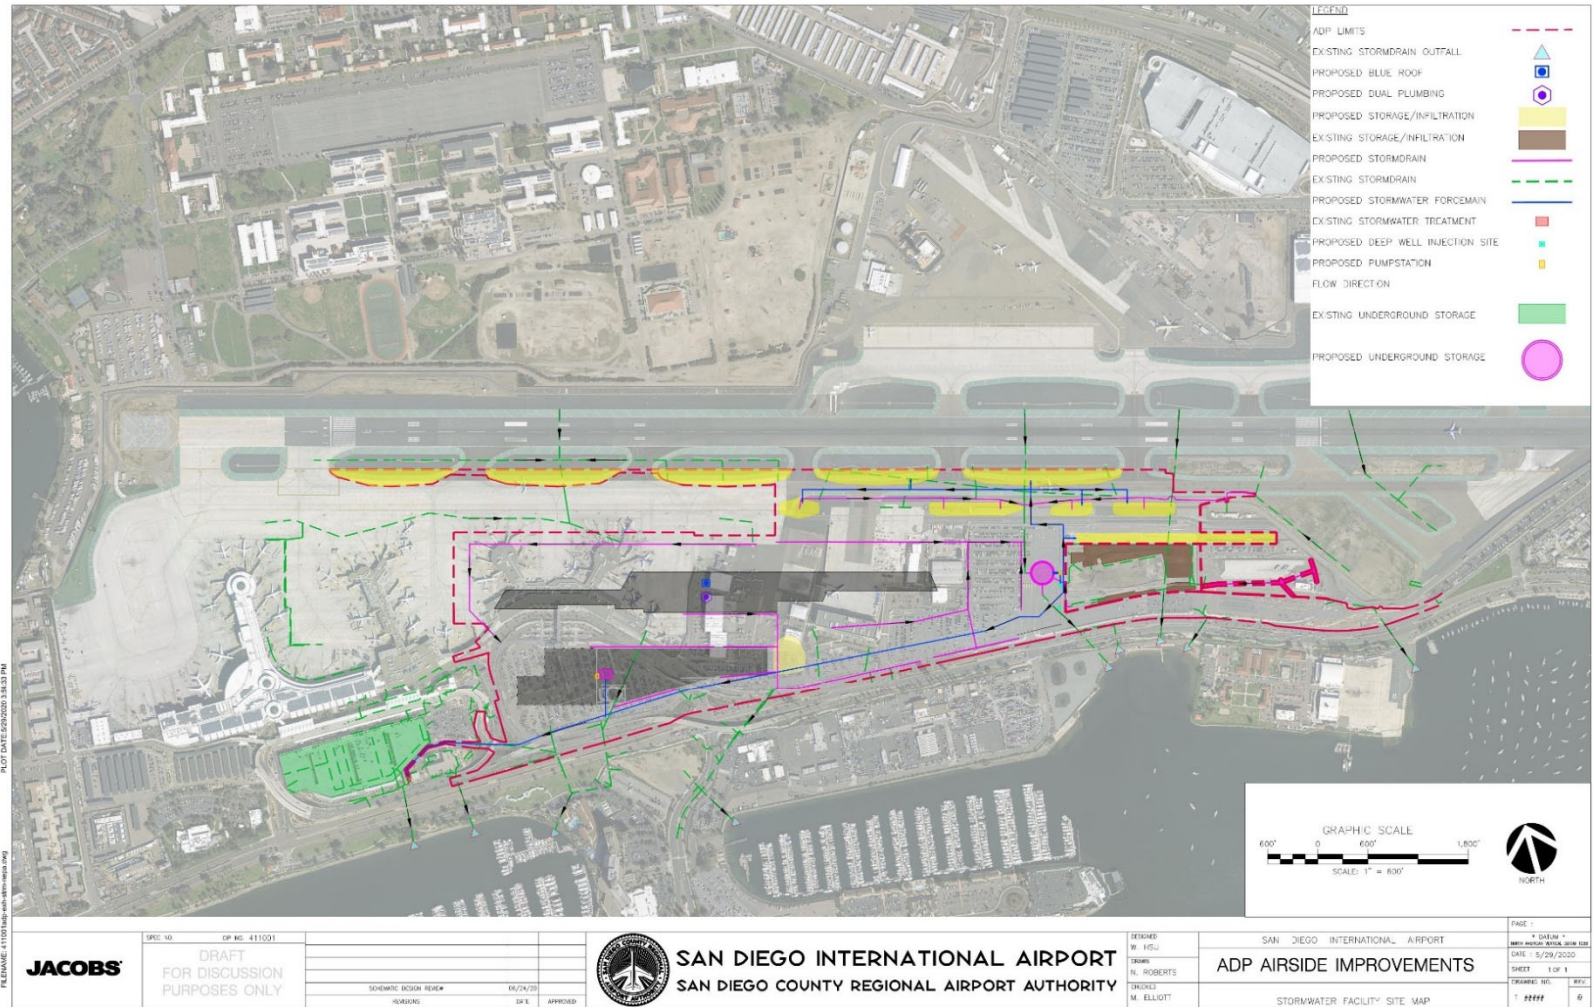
STORMWATER CAPTURE AND REUSE SYSTEM
